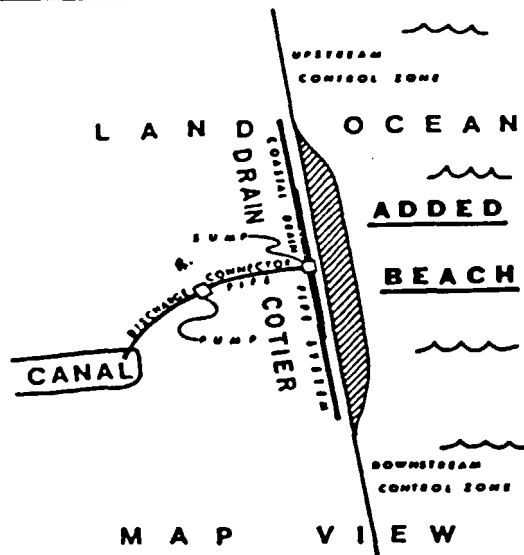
Fig. A - Diagrammatic plan (map) view of STABEACH installation
